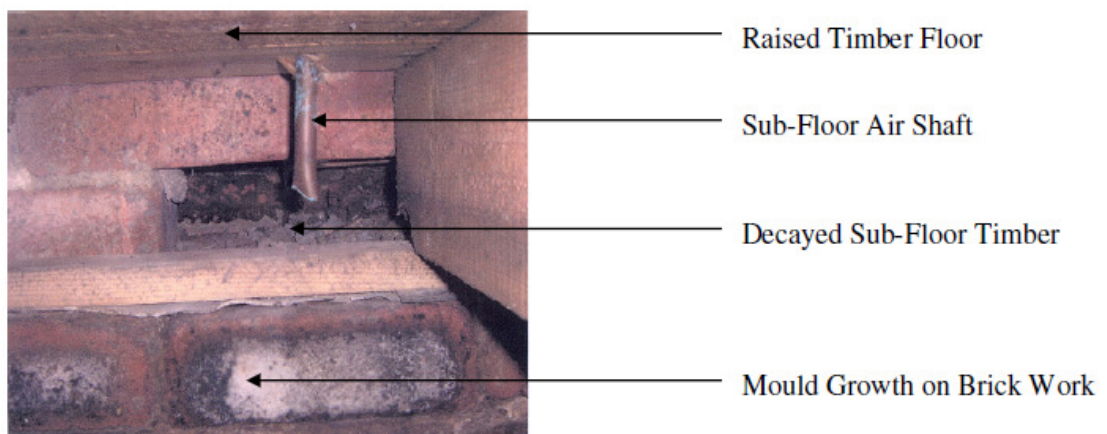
Use of air shaft for sub-floor ventilation [52]
